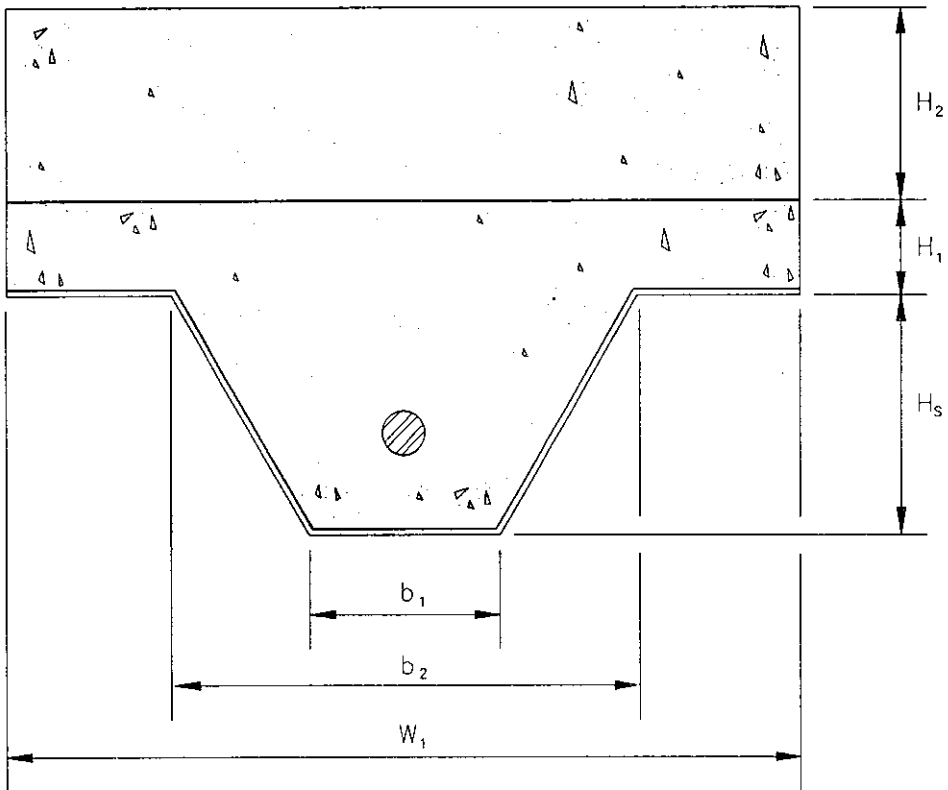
Cross section of one down corrugation of composite Bowman deck
